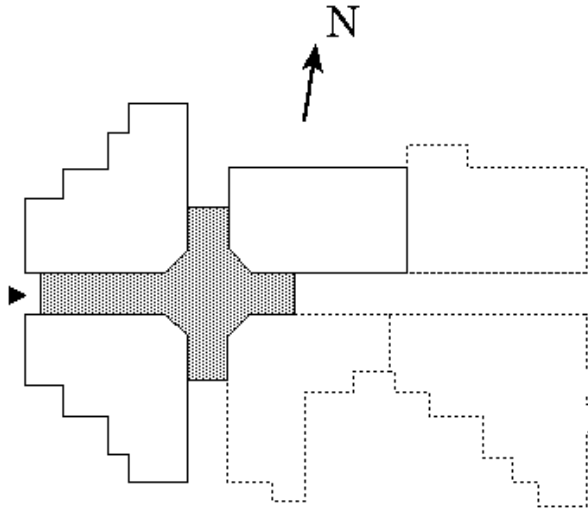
Plan of the Kabi Pharmacia laboratory (Wall & Blomsterberg, 1994).
